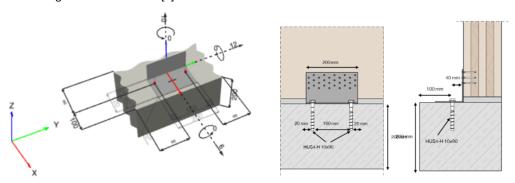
Timber wall to concrete slab fastening via angle bracket: PROFIS Engineering model and sketch of connection geometry
